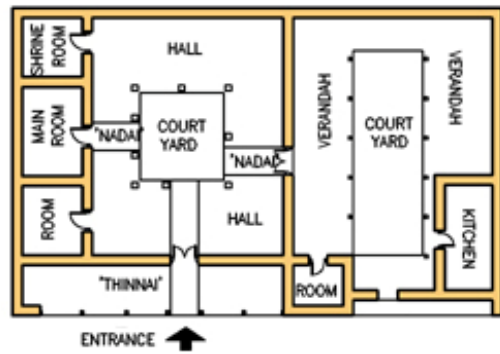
House Plan with Two Court Yards in Jaffna (Source: Author)
